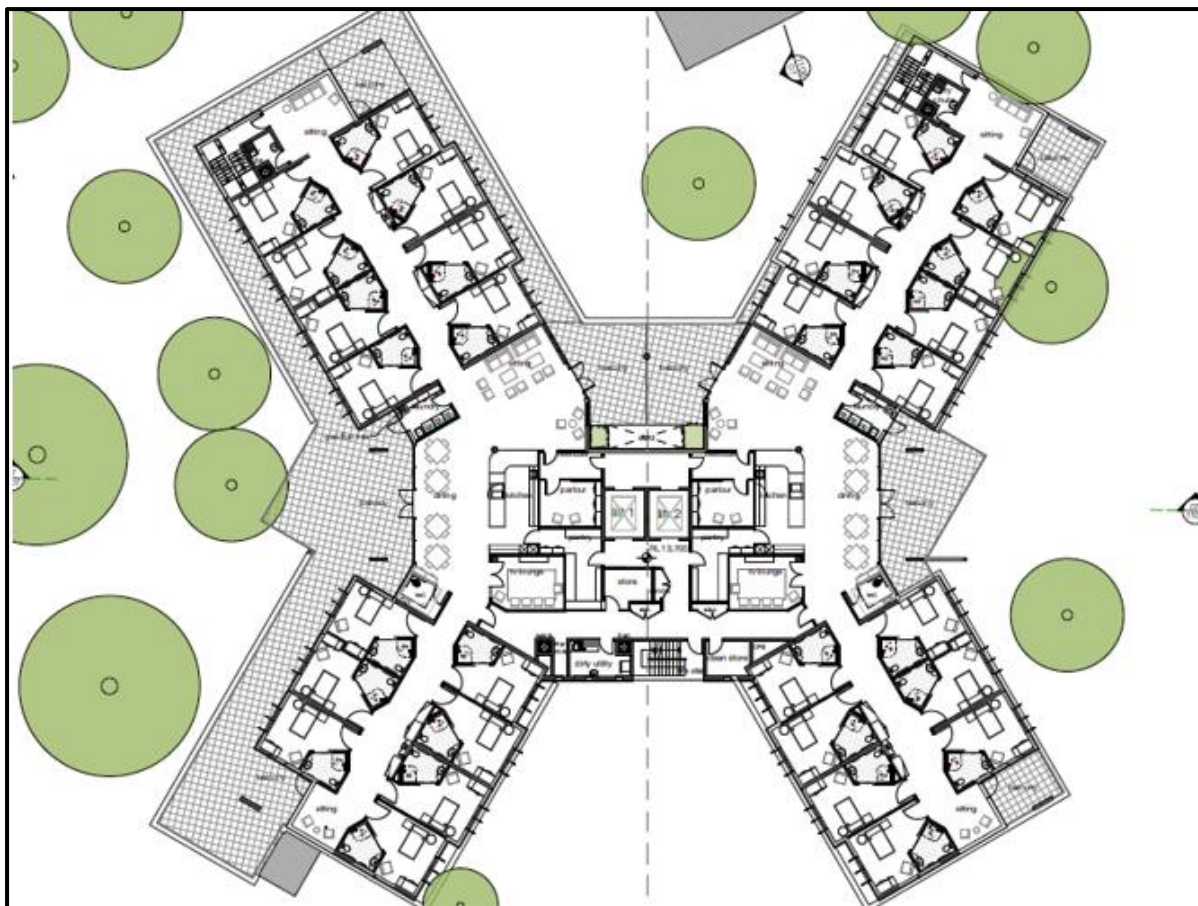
Approved B10 First Floor Plan for DA-1183/2016
